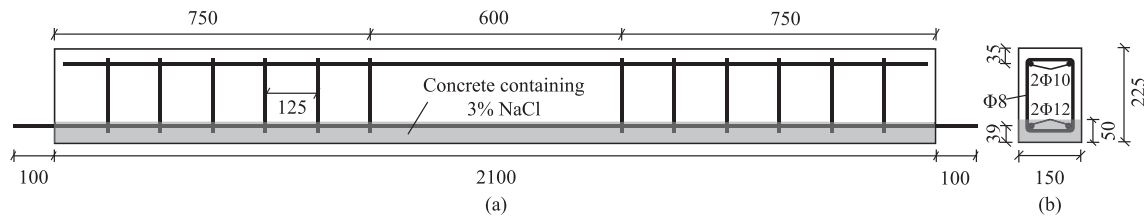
Dimensions and cross-section of the ten reinforced concrete beams cast in the laboratory (unit: mm).
